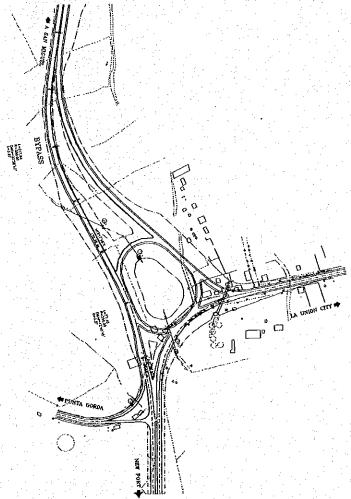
Proposed Crossing of Bypass Road Near the Port
